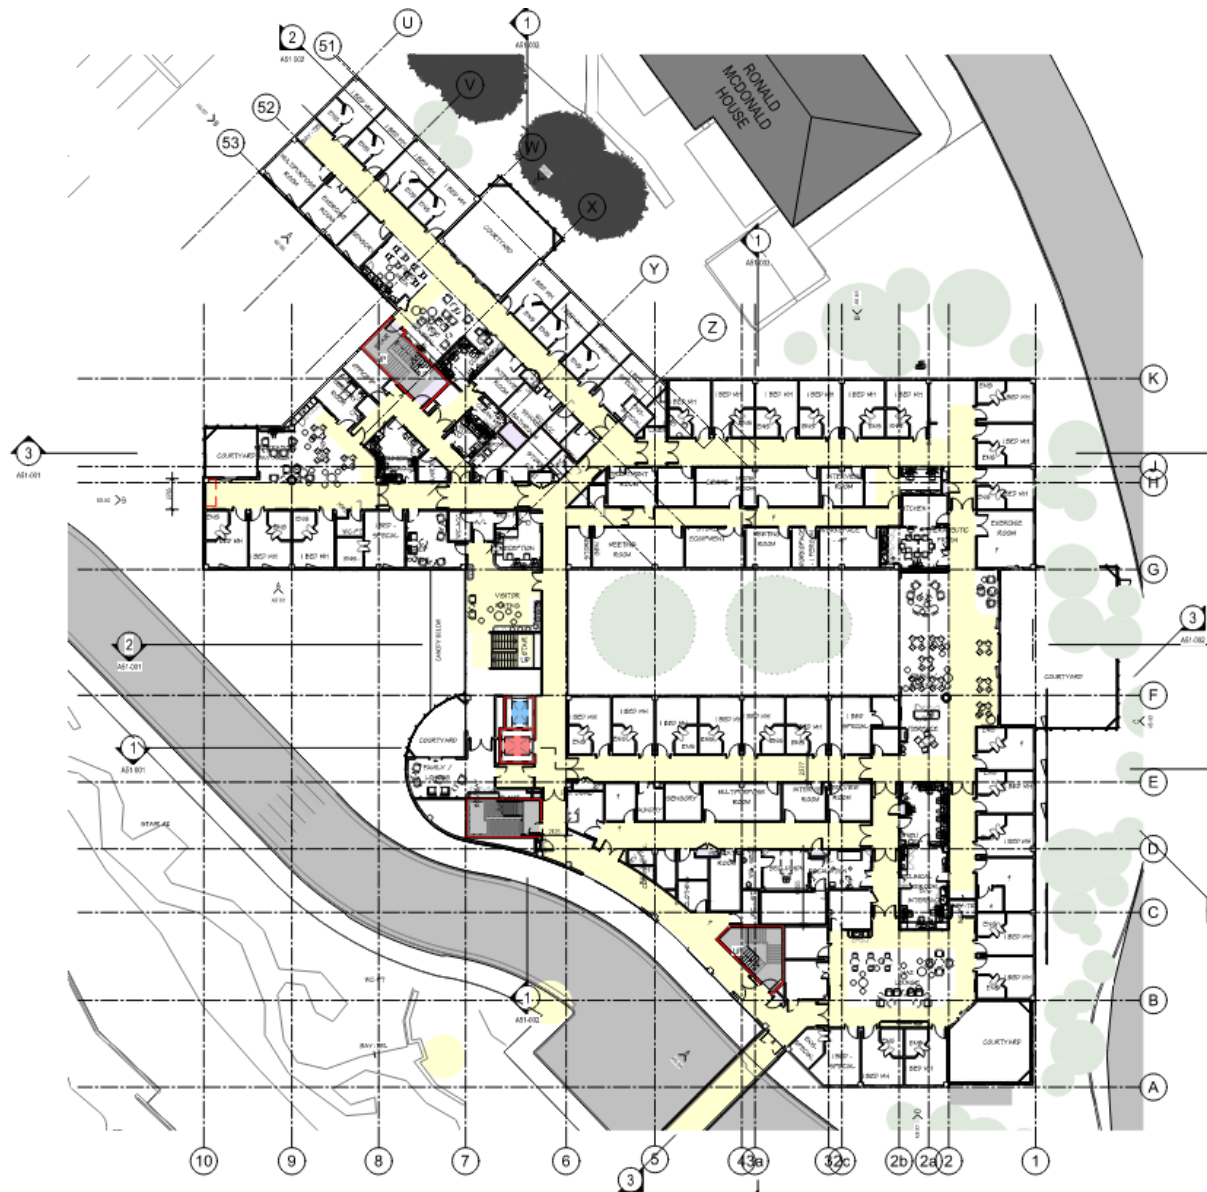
Main Building Extract from Architectural Drawings A20-200
